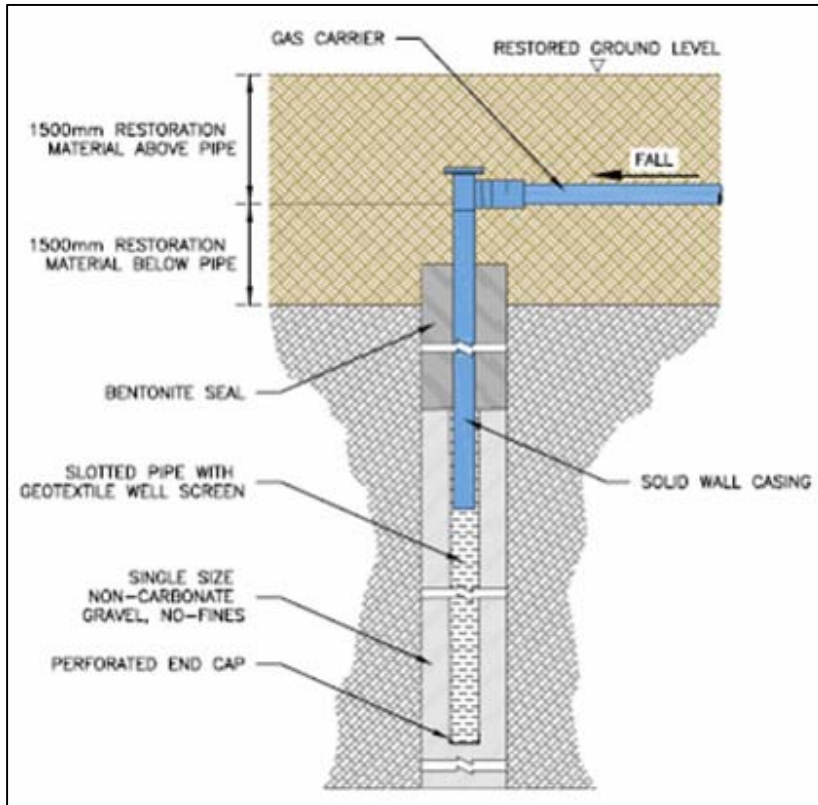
Cross section through Gas Well in the New Landfill Site
